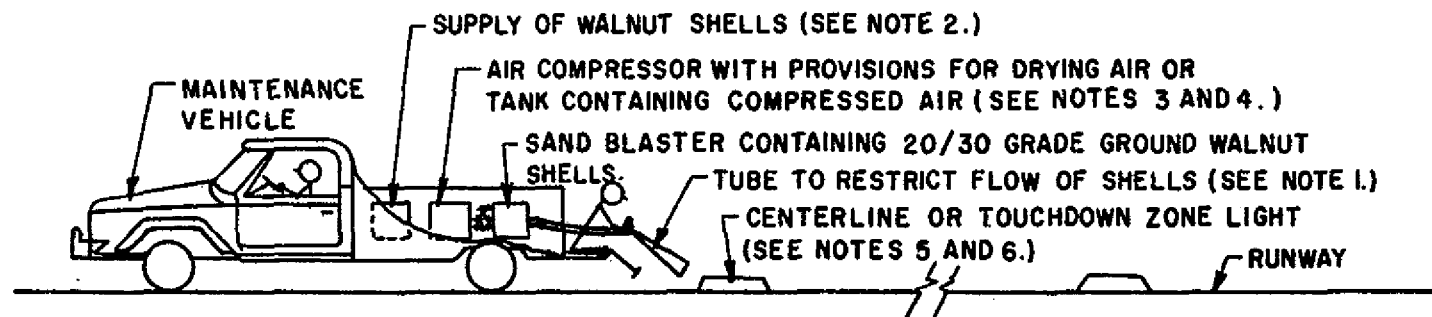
CLEANING CENTERLINE AND TOUCHDOWN ZONE LIGHTS
